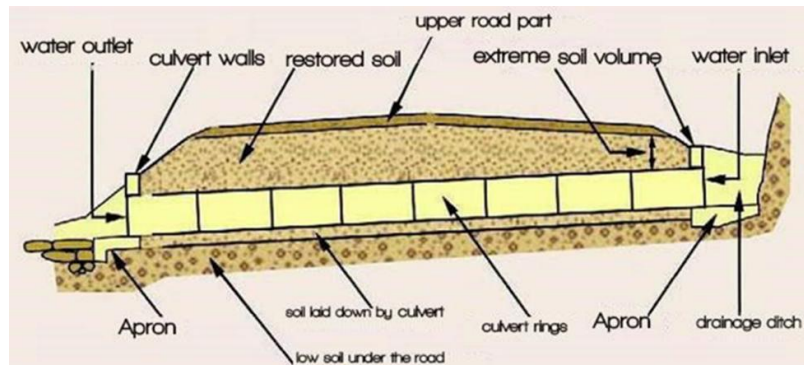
Basic components of a culvert show water inlet, culvert rings, and apron for outlet protection
